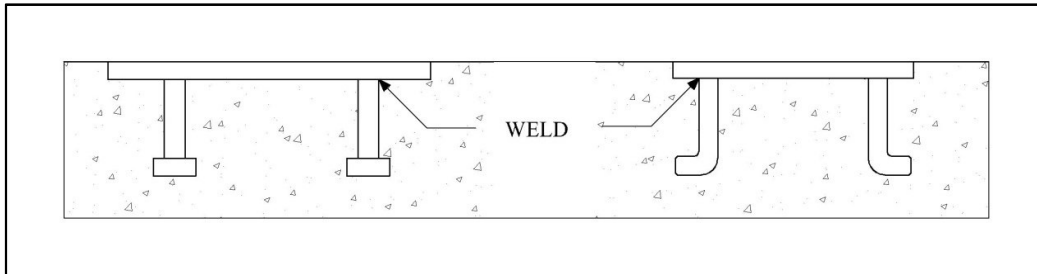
Examples of cast-in place anchors, welded studs [6]
